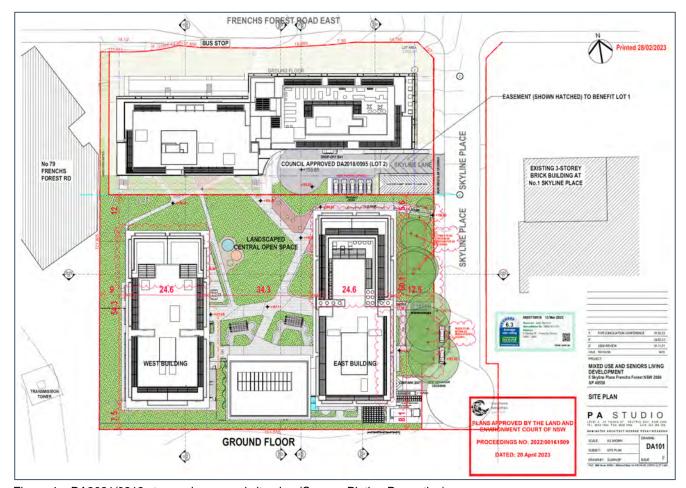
DA2021/0212 stamped approved site plan (Source: Platino Properties)
